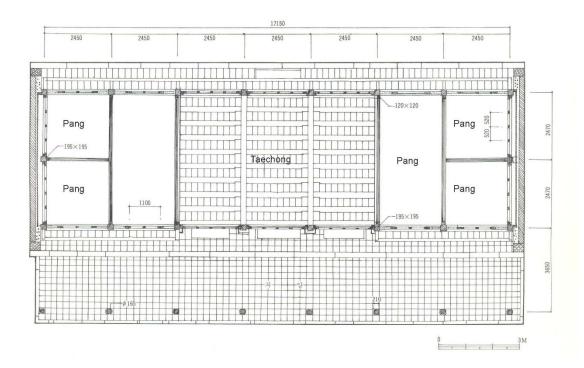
Seonhyangjae Floor Plan (N. Zu 2003)
